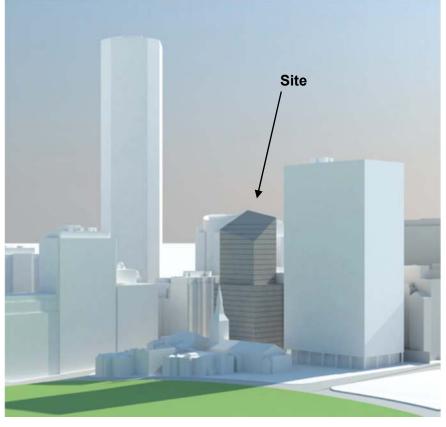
Proposed building envelope, as viewed from Hyde Park.
